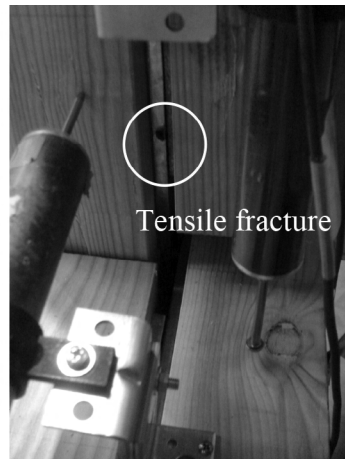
Tensile fracture of steel plate of D-member of beam
